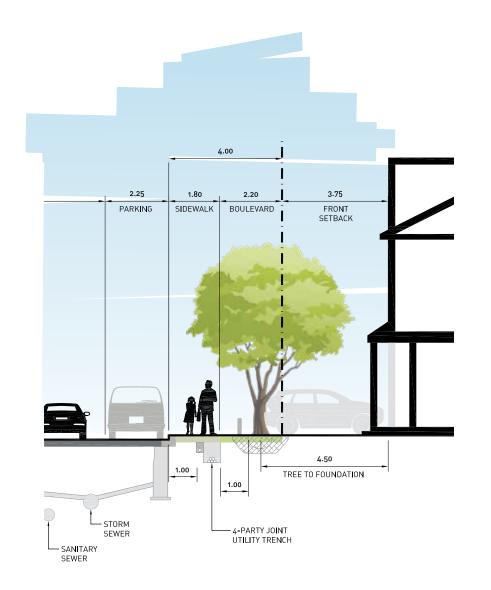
16.5m Local Road with Curb-Face Sidewalk
